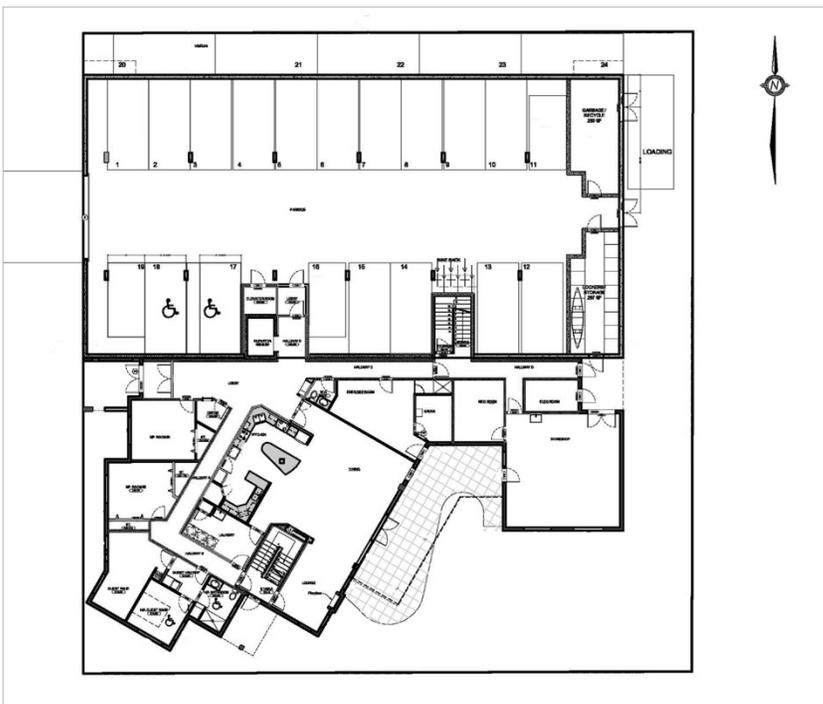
Floor plan of the common house [Wolf Willow Cohousing].
